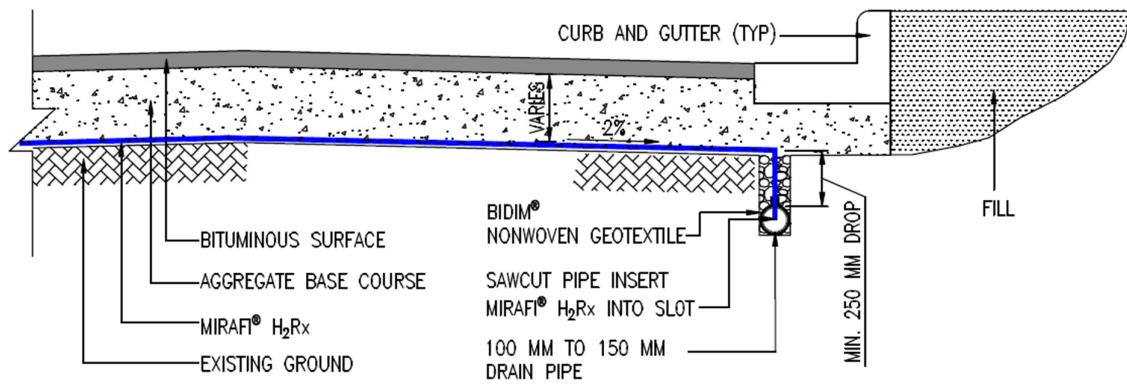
(b): A typical cross section diagram for geotextile edge terminated in a saw-cut pipe.
